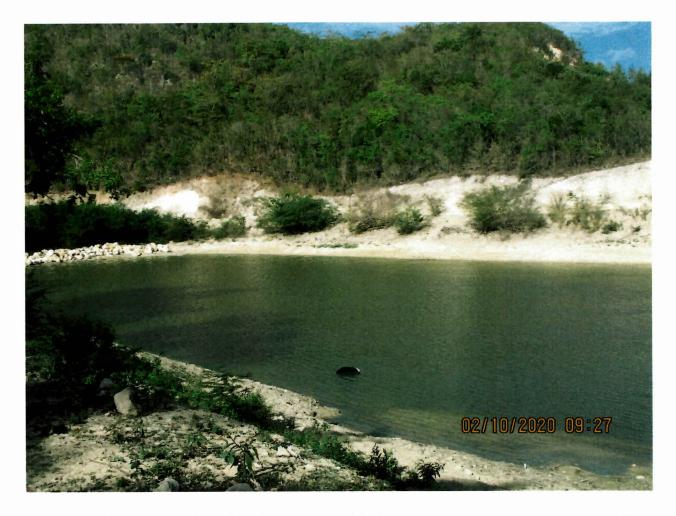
Panoramic view showing intermediate berm and area of previous excavation with stormwater.
